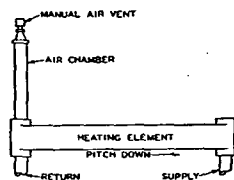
Typical Air Vent Valve Installation on Heating Element
